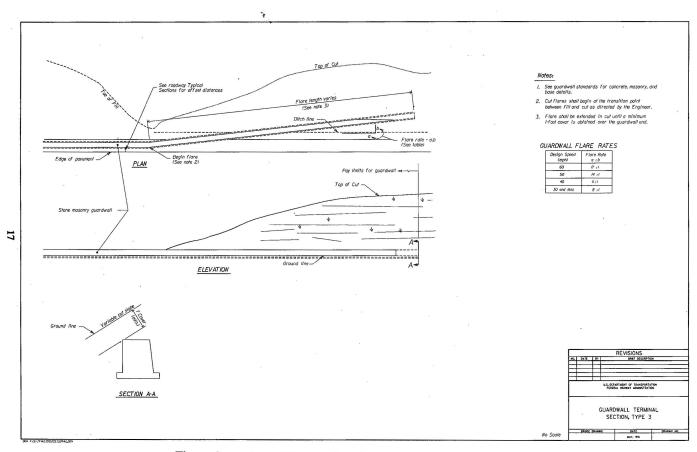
Stone Masonry Guardwall -- Terminal Details (continued).
